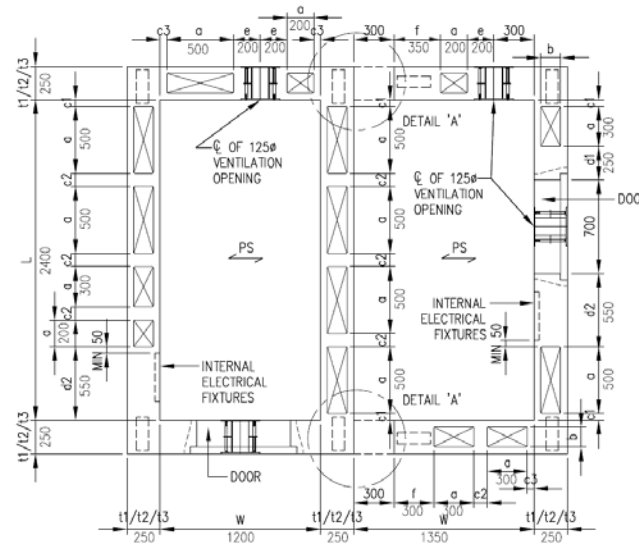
A: PRECAST HS AND C-SHAPED PRECAST HS
